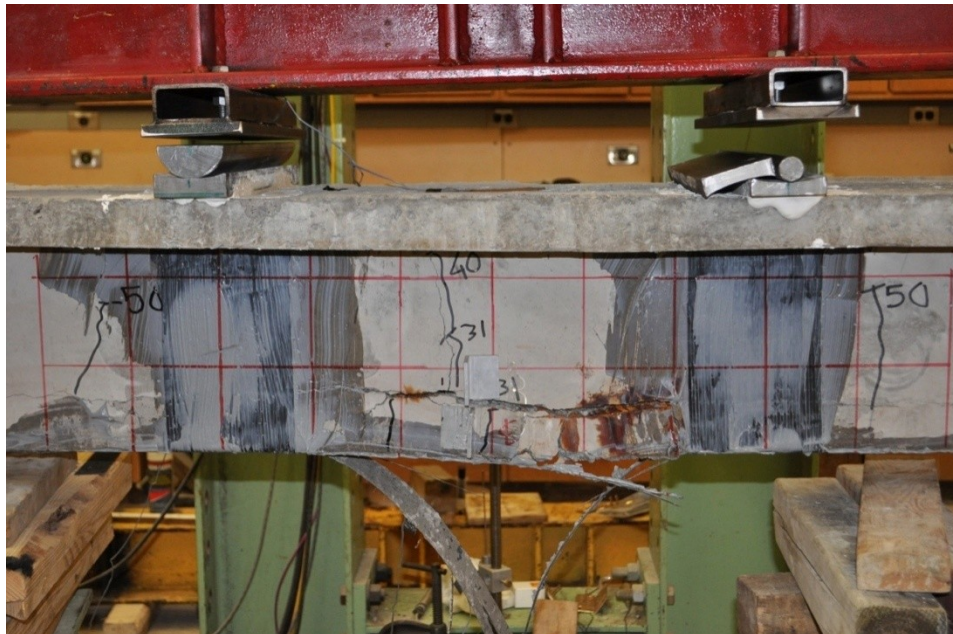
Typical failure of a prestressed beam repaired by CFRP sheets
